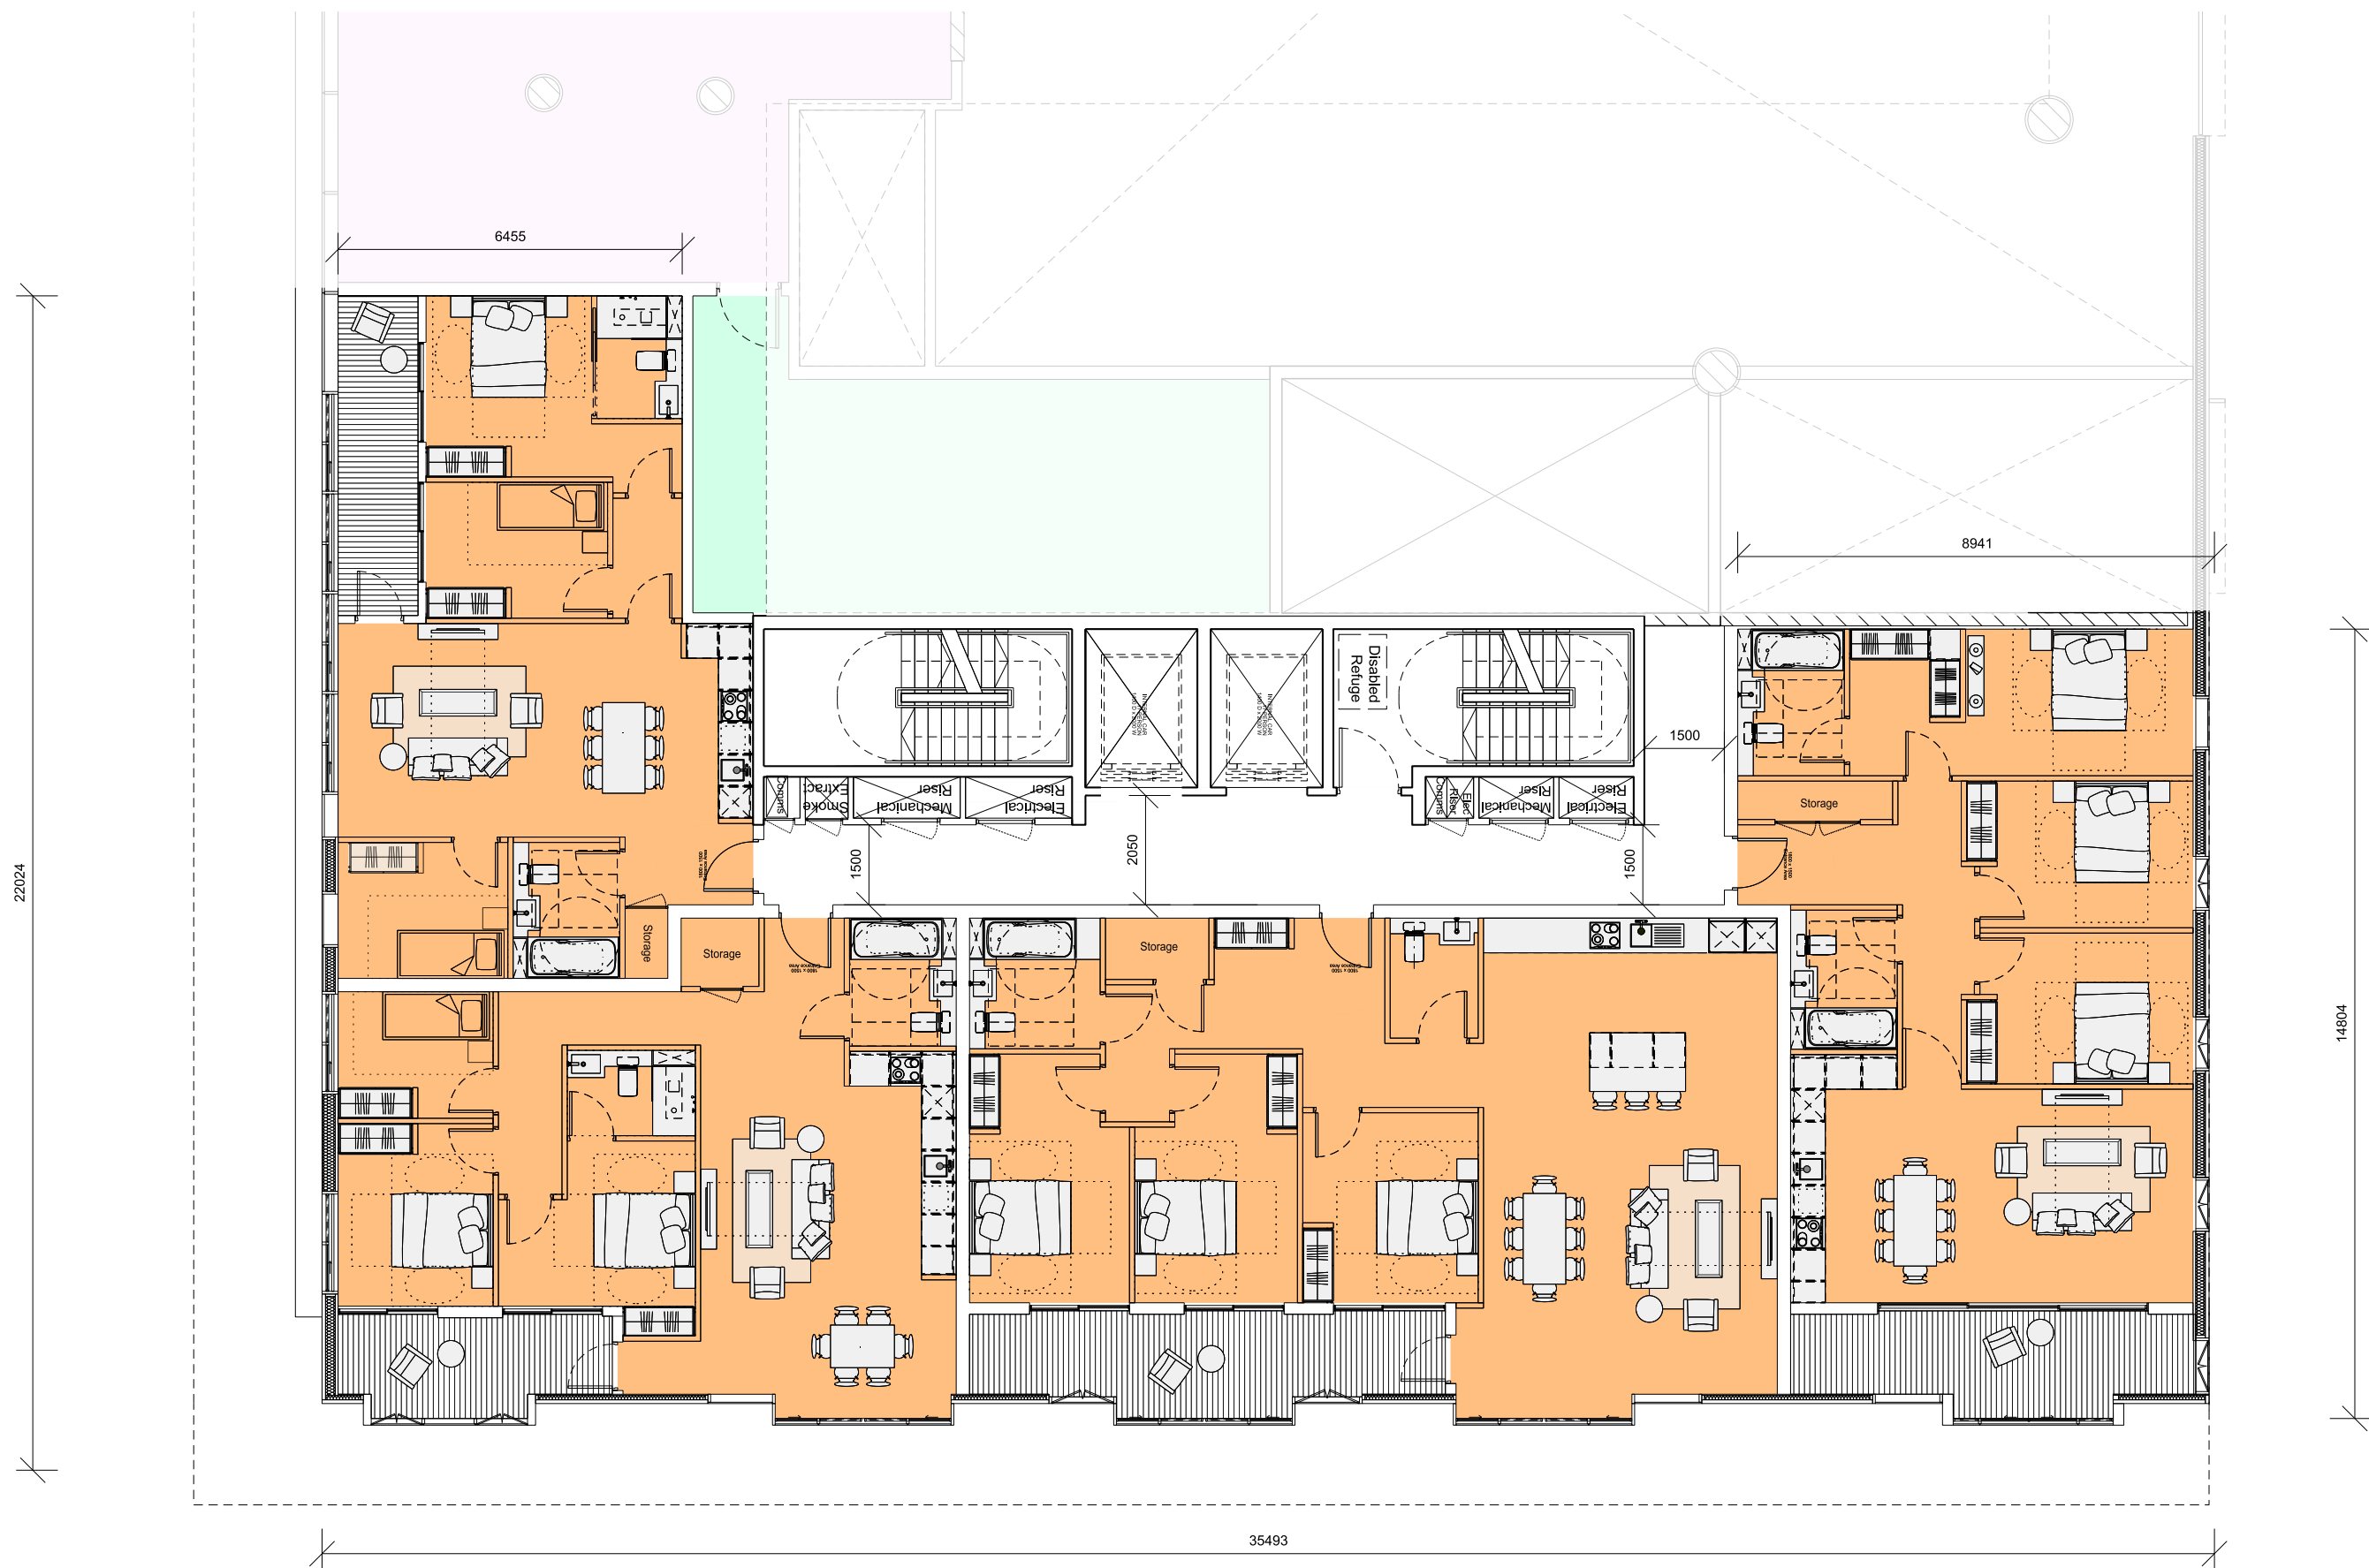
Mezzanine level floor plan of the residential component of the building
